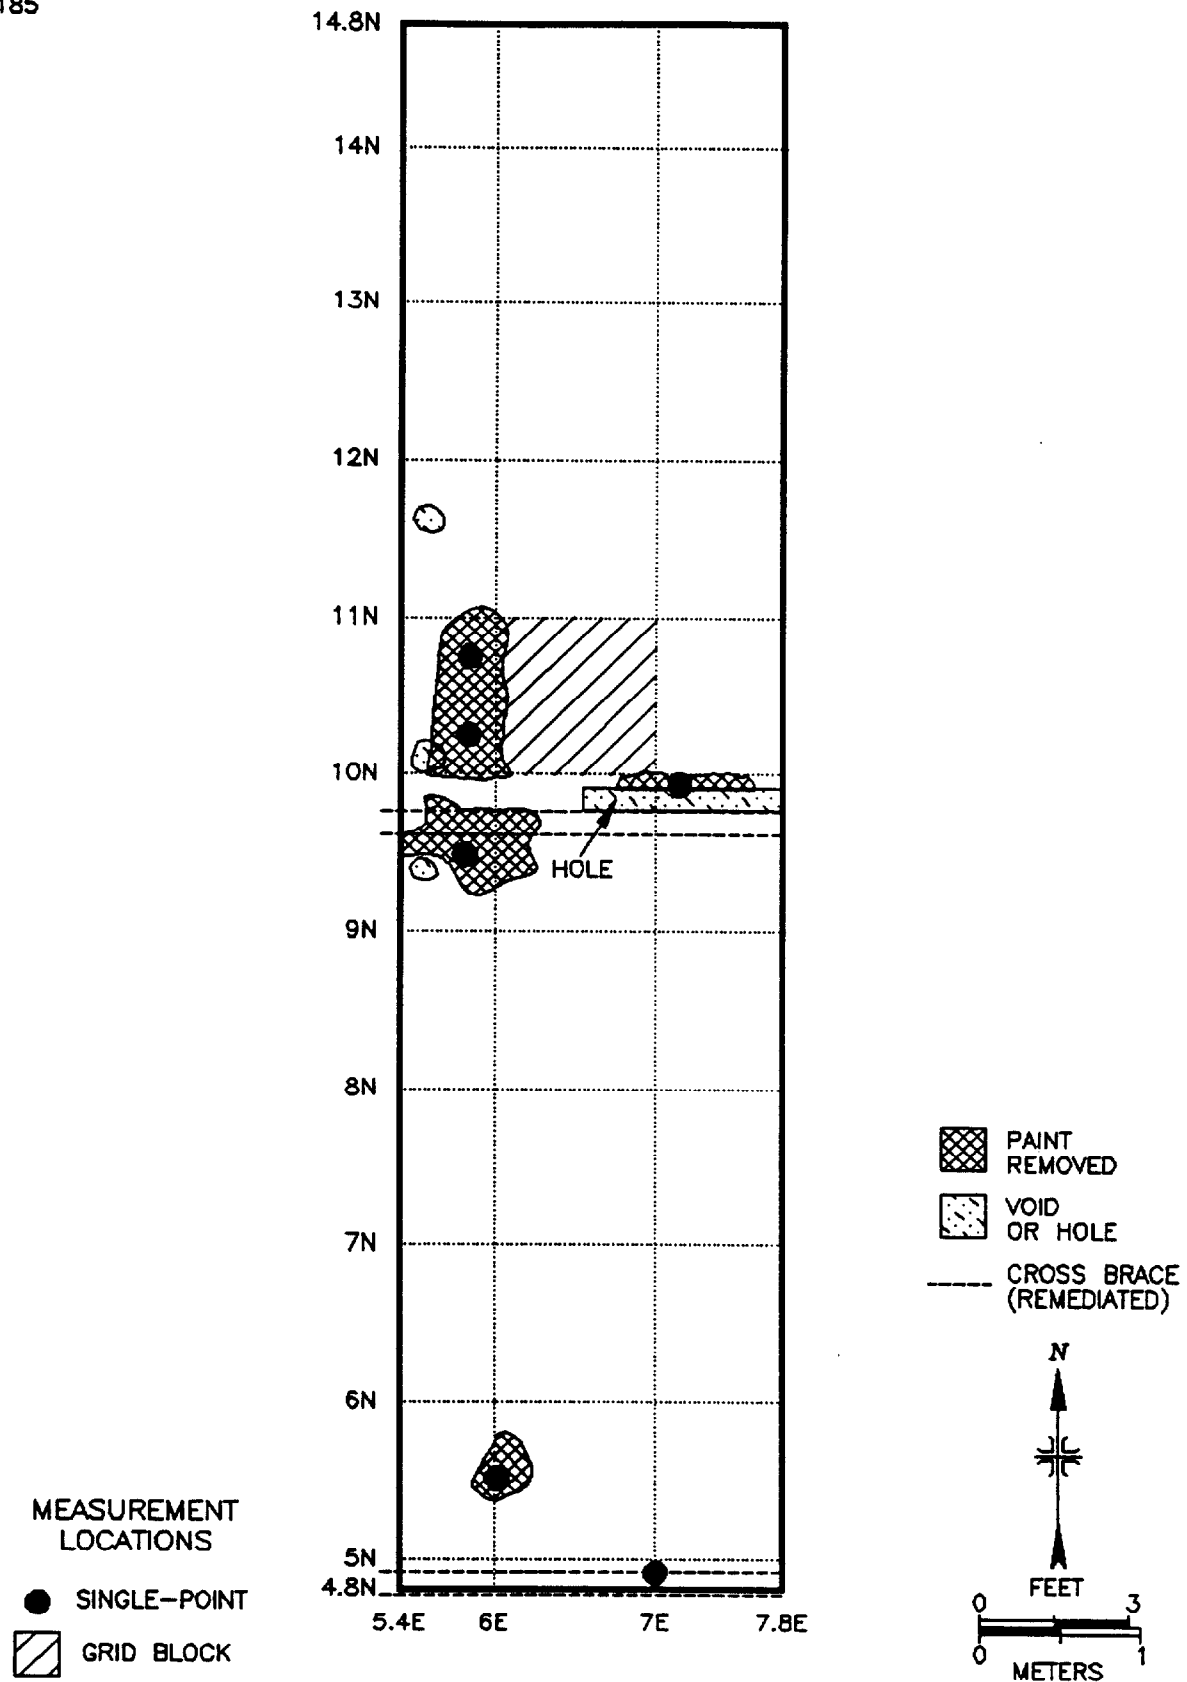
Building 30, Fabrication Room, West Mezzanine – Remediated Areas and Measurement and Sampling Locations
